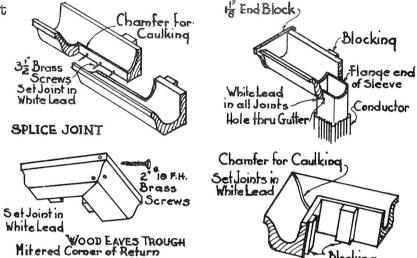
ASSEMBLY OF WOOD GUTTERS
